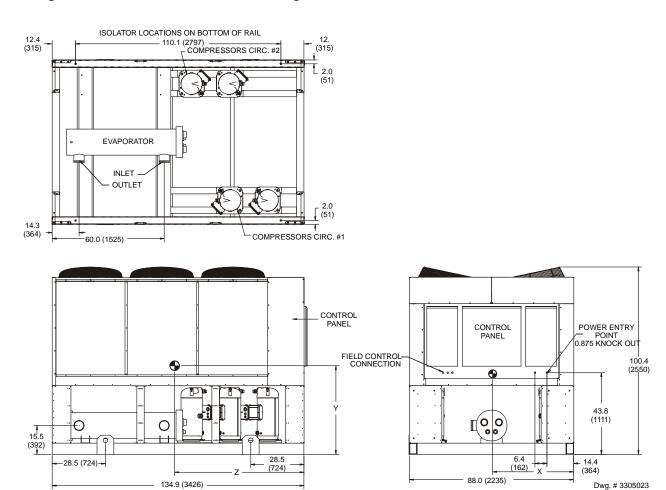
, Dimensions, AGZ 026BS - 070BS Packaged Chiller
